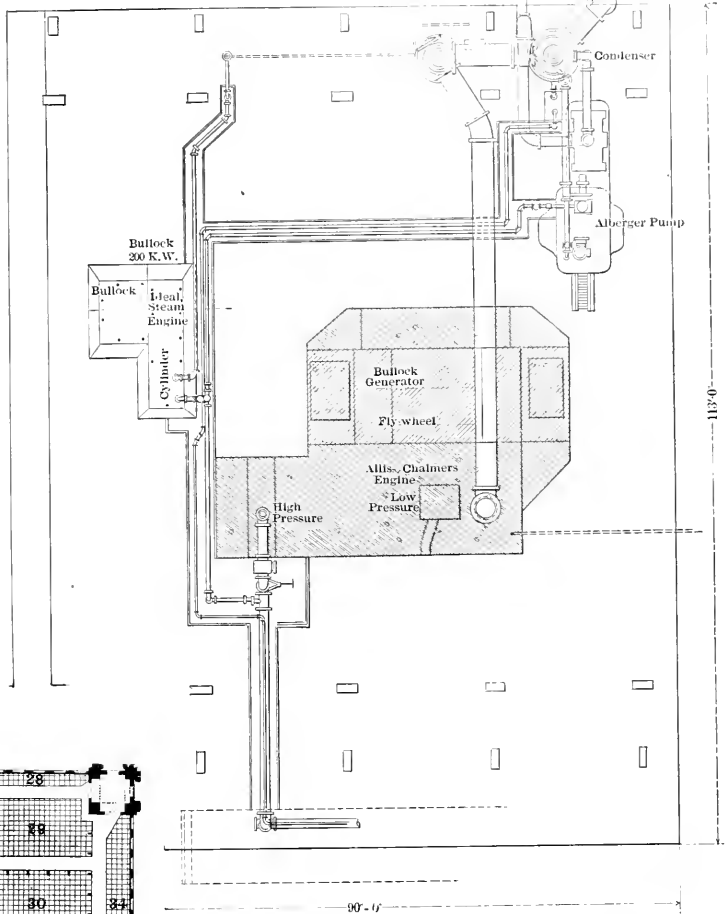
PLAN OF POWER EXHIBIT AT ST. LOUIS FAIR.
